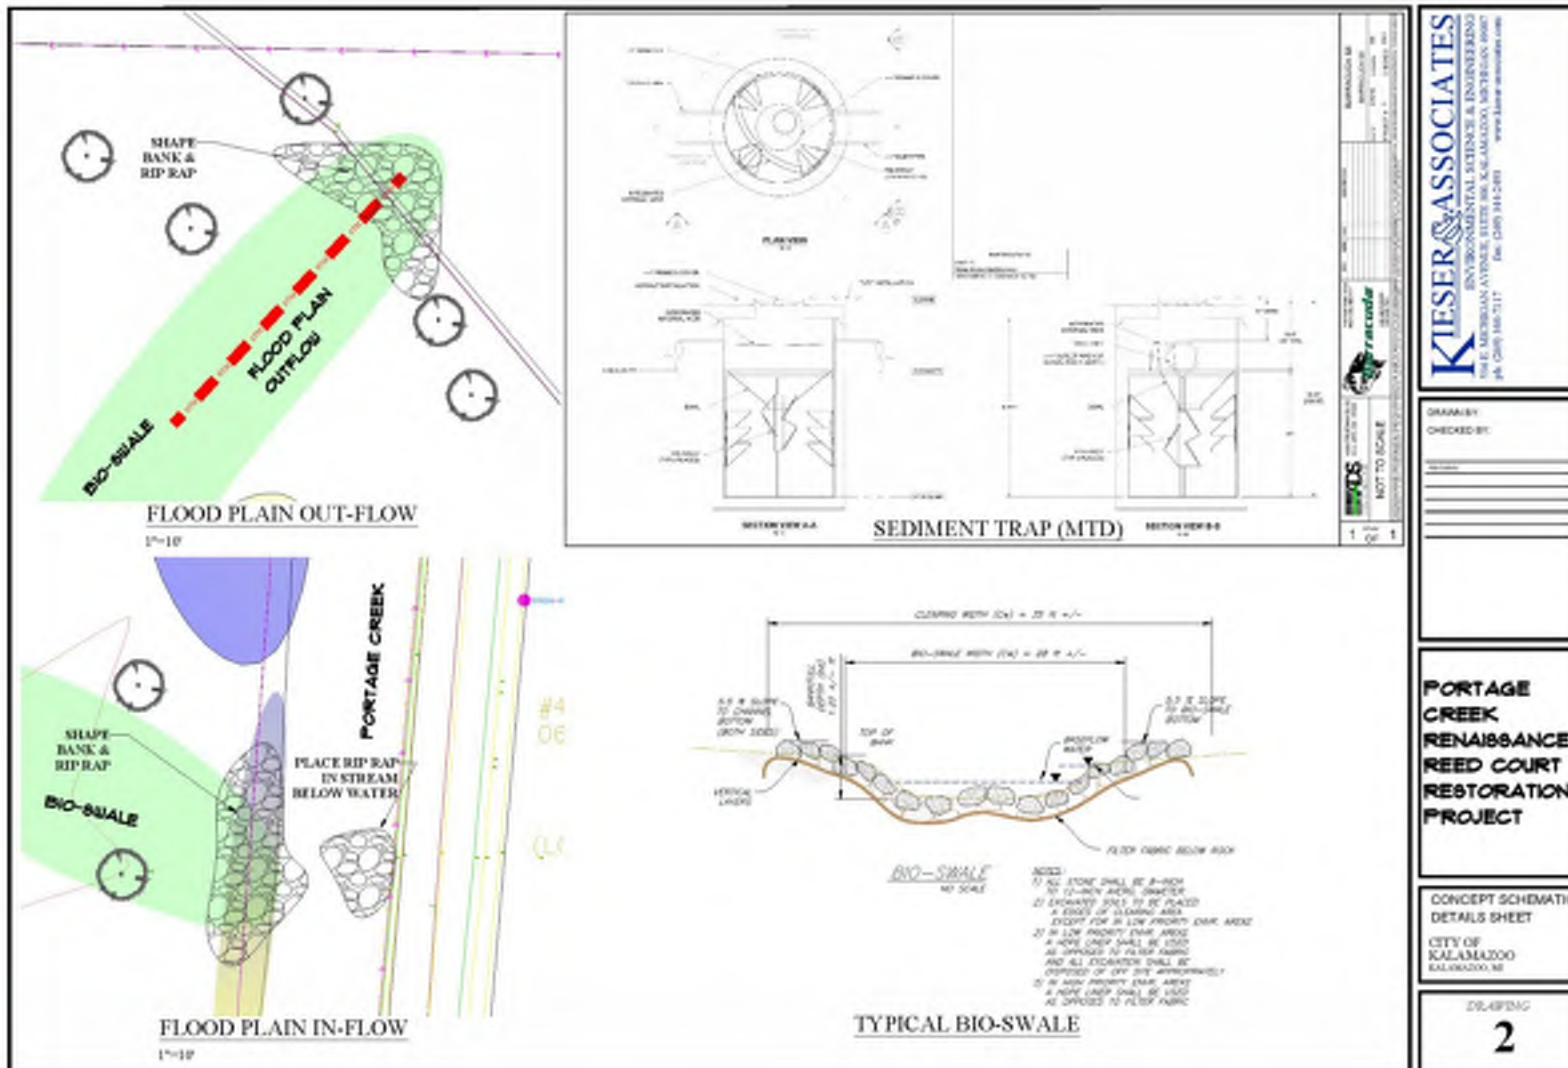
Detailed Conceptual Drawings of Reed Court Floodplain and Stormwater Improvement Project for MTD, bio-swales, flood plain inlet and outlet with Portage Creek.
